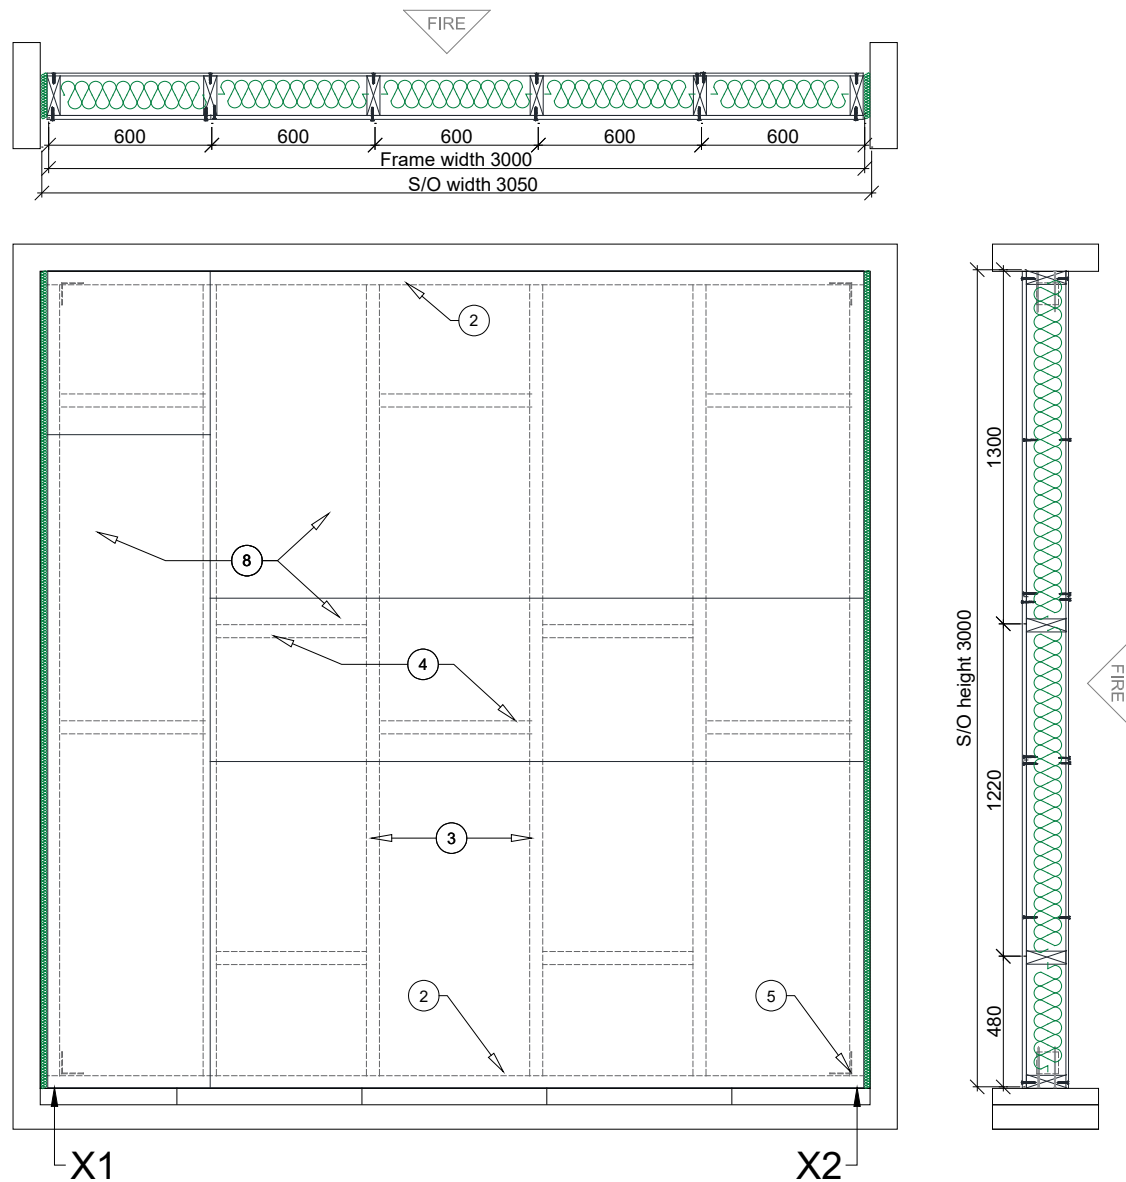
General arrangement of test construction viewed from the unexposed surface
